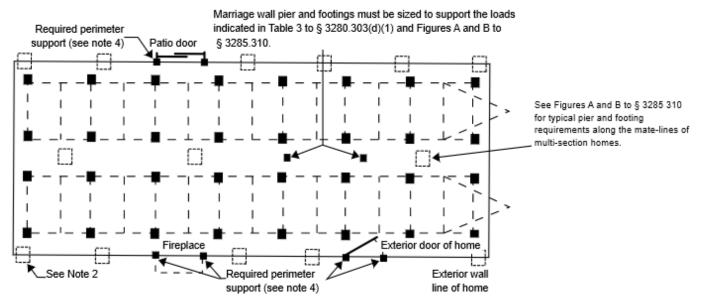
Typical Blocking Diagram for Multi-section Home.
